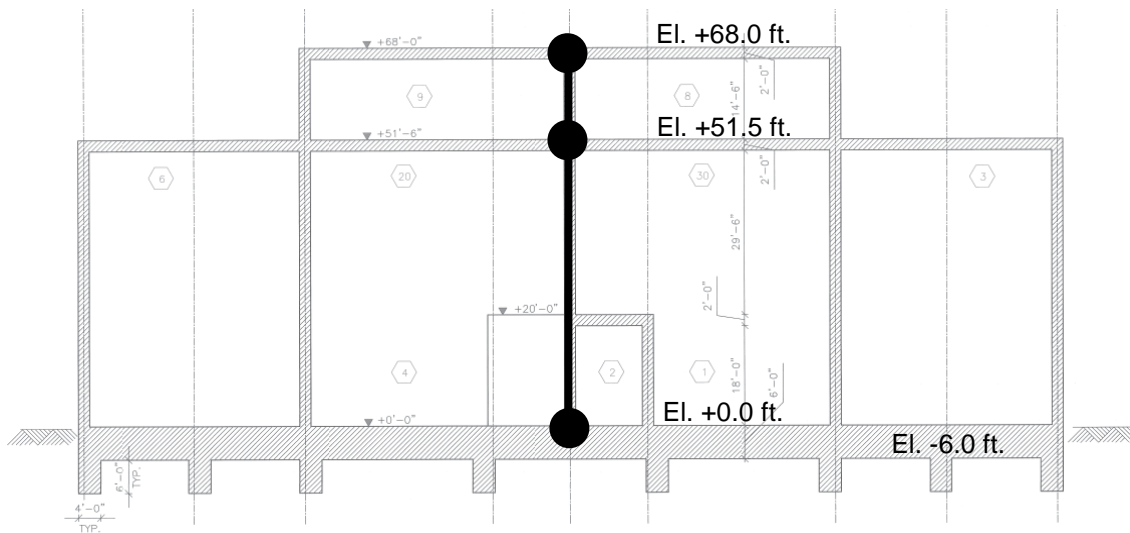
Building Cross Section showing Building Idealization as Stick Model
